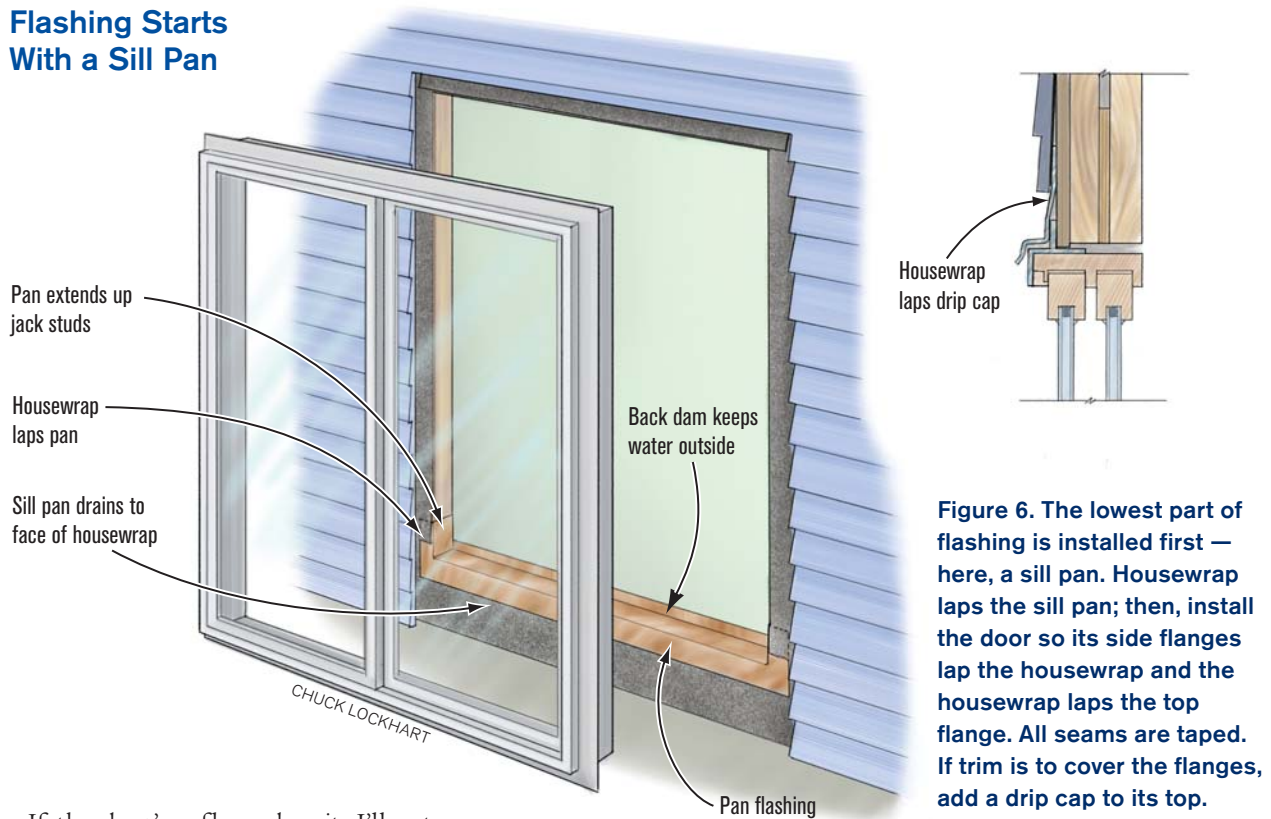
The lowest part of flashing is installed first — here, a sill pan. Housewrap laps the sill pan; then, install the door so its side flanges lap the housewrap and the housewrap laps the top flange. All seams are taped. If trim is to cover the flanges, add a drip cap to its top.
